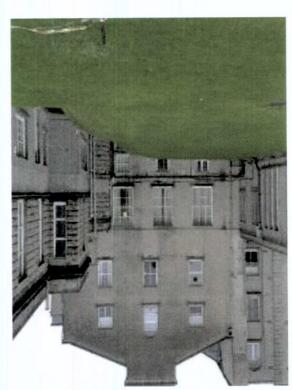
View of the much modified southern elevation of Milltown Park House where it connects to the Rear Extension, Finlay Wing and the Archive building
